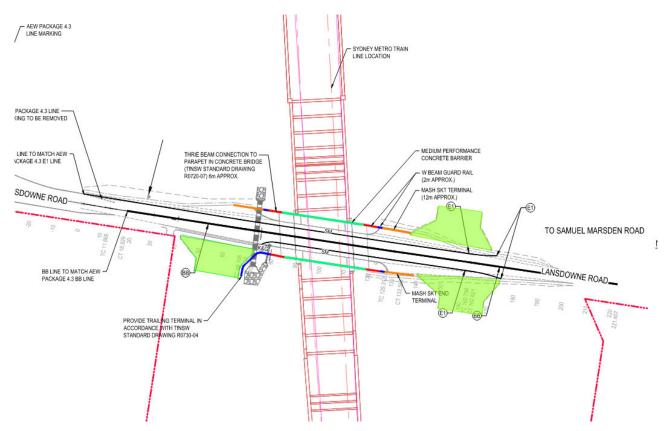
Proposed site access/egress gate on Lansdowne Road during Traffic Stage 3 (indicative purpose only)
